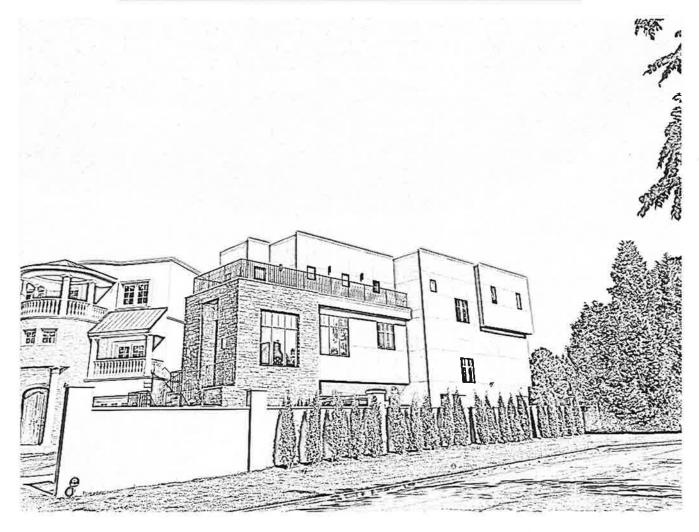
" - Conceptual Wall / Fence Diagrams (North Elevation)
